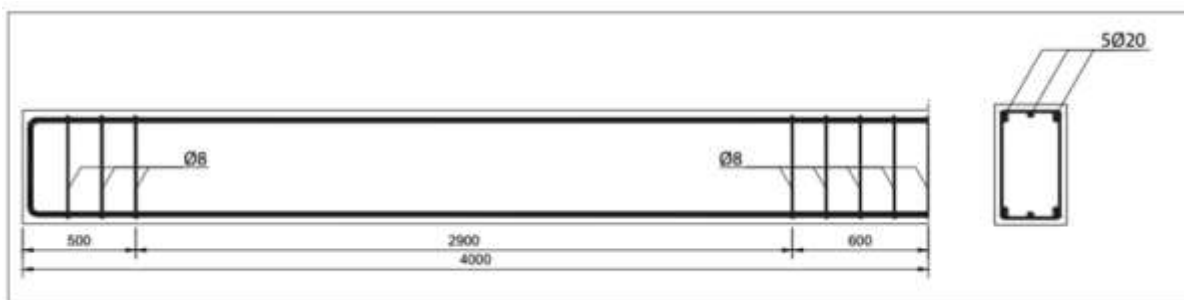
18 Reinforcement layout for specimen from experiment 2(Unit: mm) [5]
